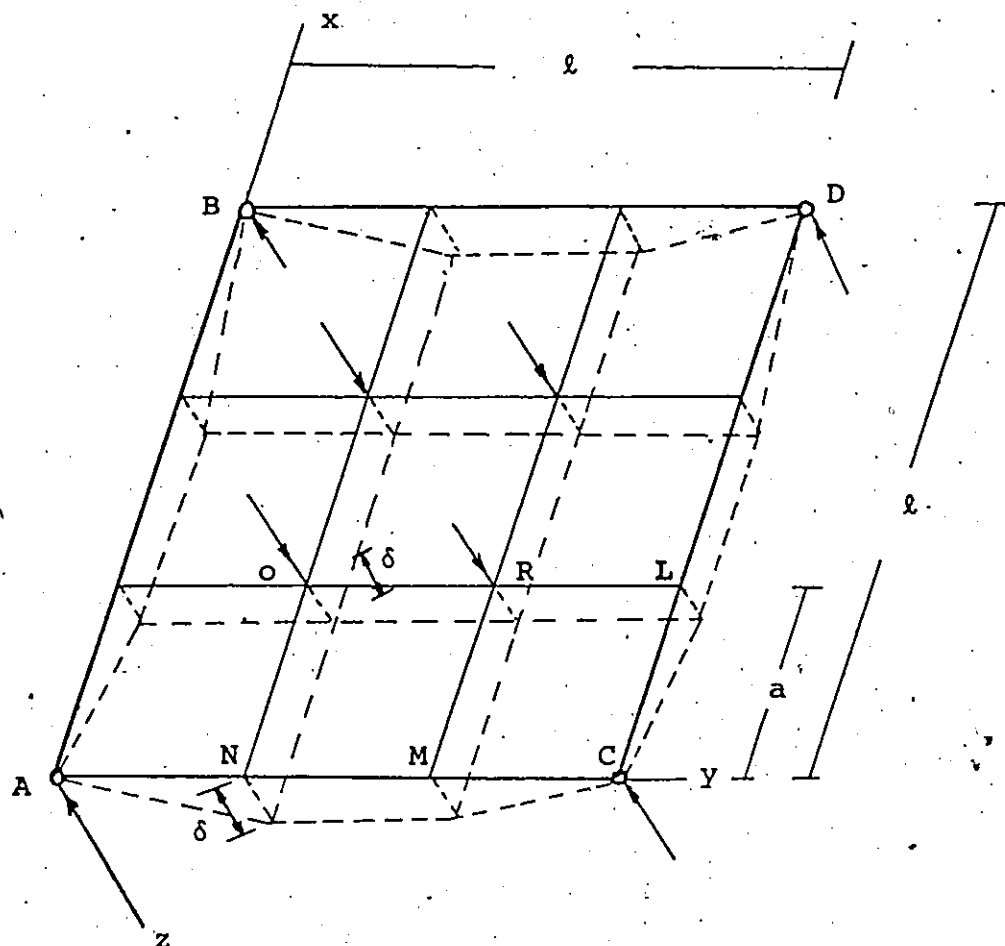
COLLAPSE MODE ASSUMED FOR TEST TRUSS TYPE TWO (MODEL 2)
